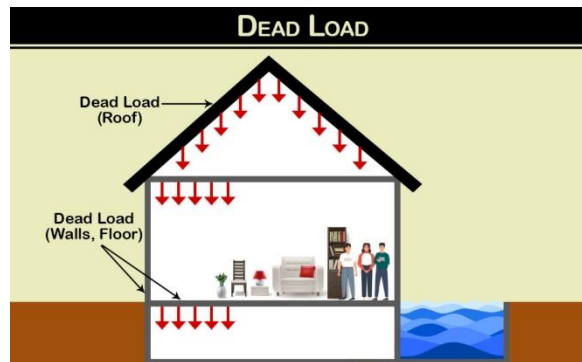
Structural Dead Loads. Roof, walls, floor, etc.
